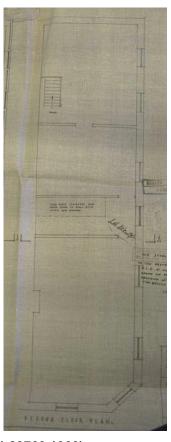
(left) Ground floor plan as proposed in 1960 (CRO(B) 23760 1960)
